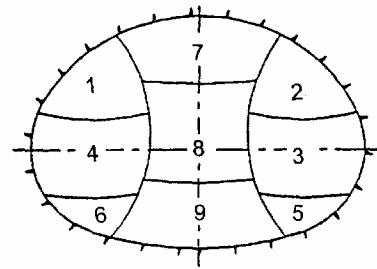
Twin side drift and central pillar excavation method. Temporary support consists of double wire mesh reinforced 250 - 300 mm thick shotcrete shells with embedded lattice girders or HEB 160 steel sets at 0.75 - 1 m spacing.
